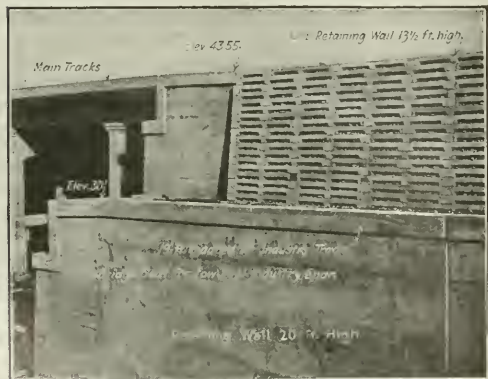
CRIB RETAINING WALL ON ROCK ISLAND LINES; CHICAGO
